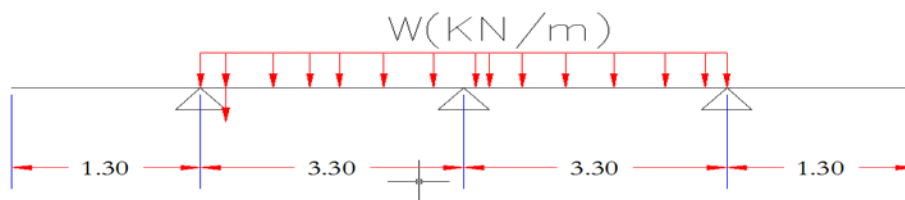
5 Live load applied for 1m strip of 20m span one of double cell box girder railway bridge deck
